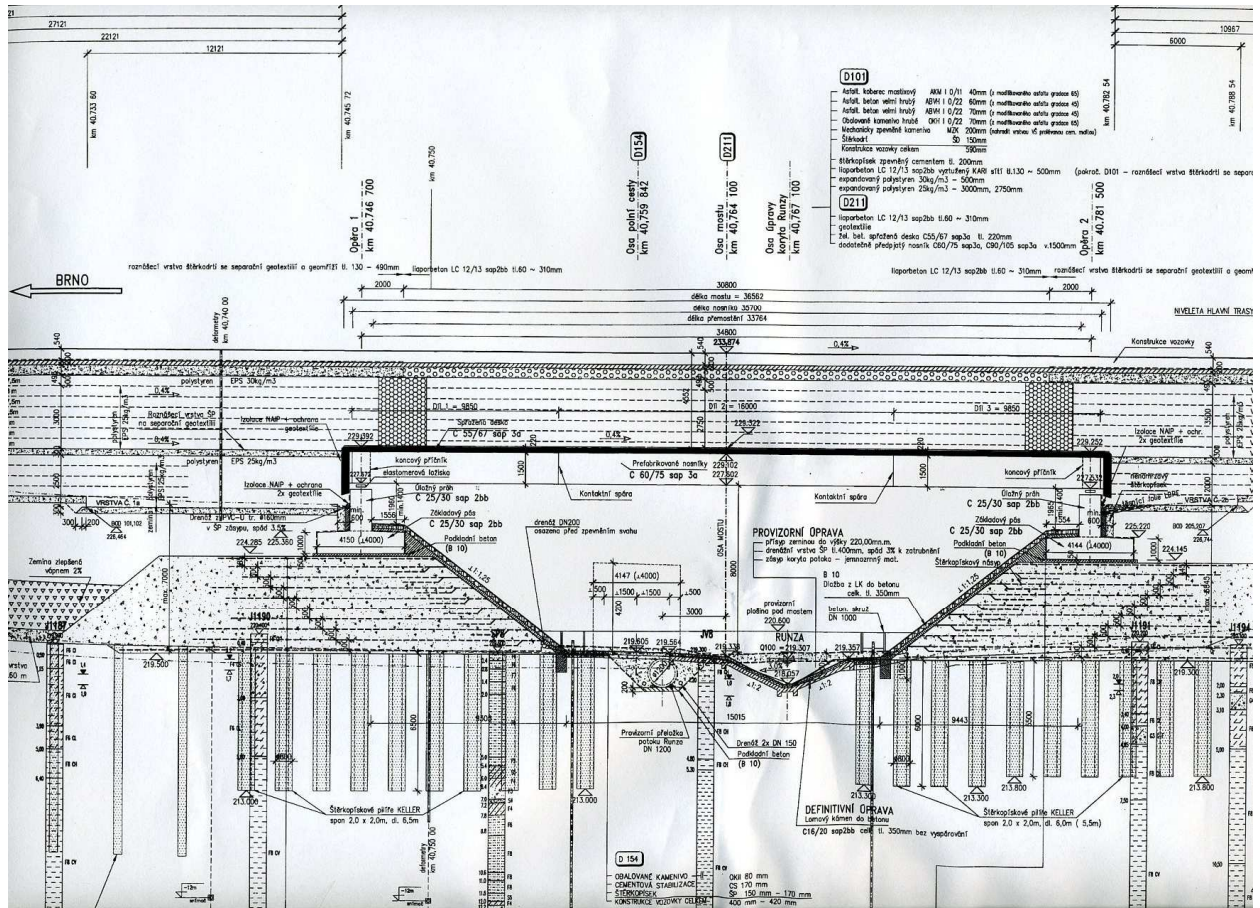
Runza filled spandrel bridge. Longitudinal cross section.
